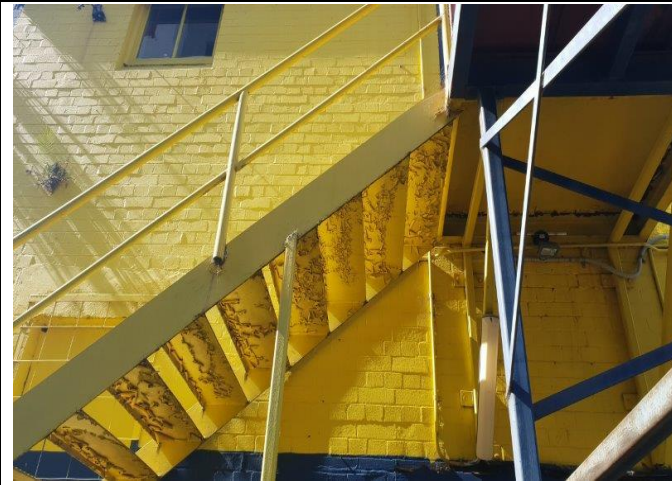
138 Parramatta Road, metal staircase, lead containing yellow paint (WSP-064198).
